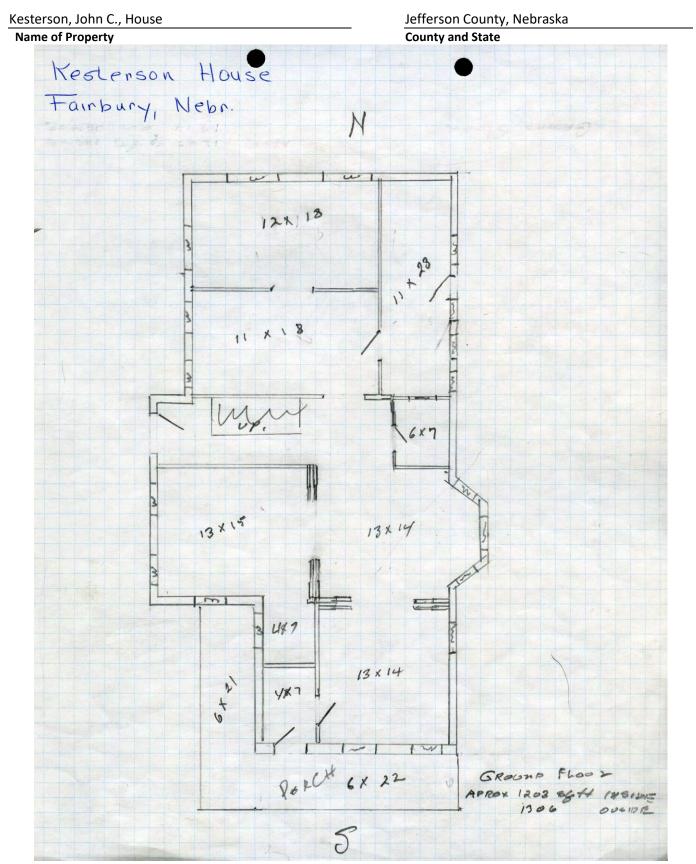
John C. Kesterson House, Floor plan, first floor, preparer unknown (NeSHPO site files, JF04-045).
